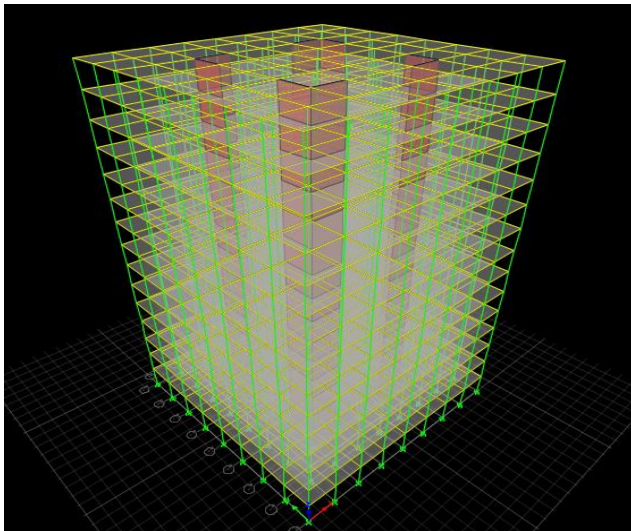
3D view of model with Shear Wall Position-3 (SWP-3)
